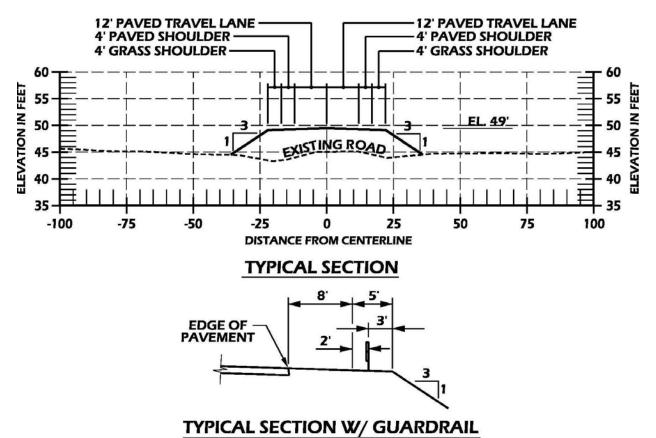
Typical Sections for U.S. Highway 258, N.C. Highway 111 and Shiloh Farm Road – Segment 4
